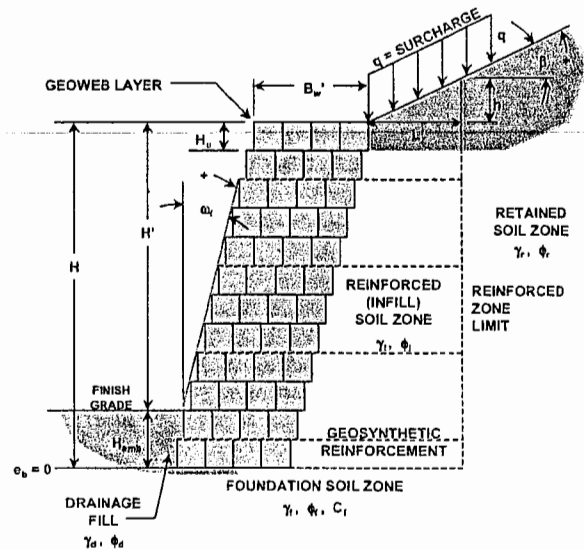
Design Model, Soil Reinforced Geoweb Wall
